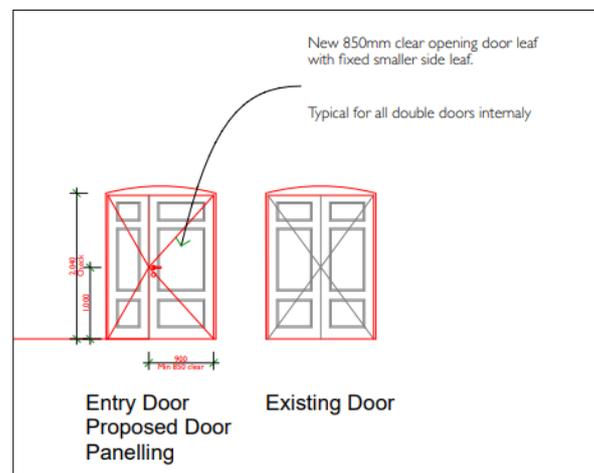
Extract from Plans detailing Existing and Proposed Doors
